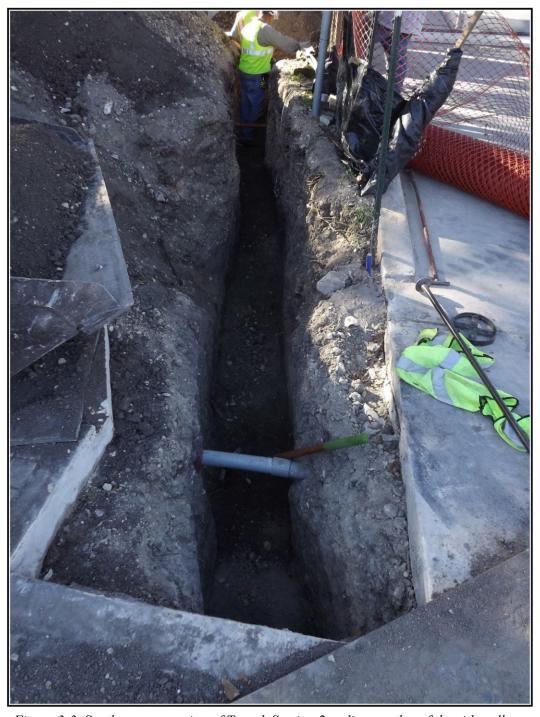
Southeastern portion of Trench Section 2 ending at edge of the sidewalk.
